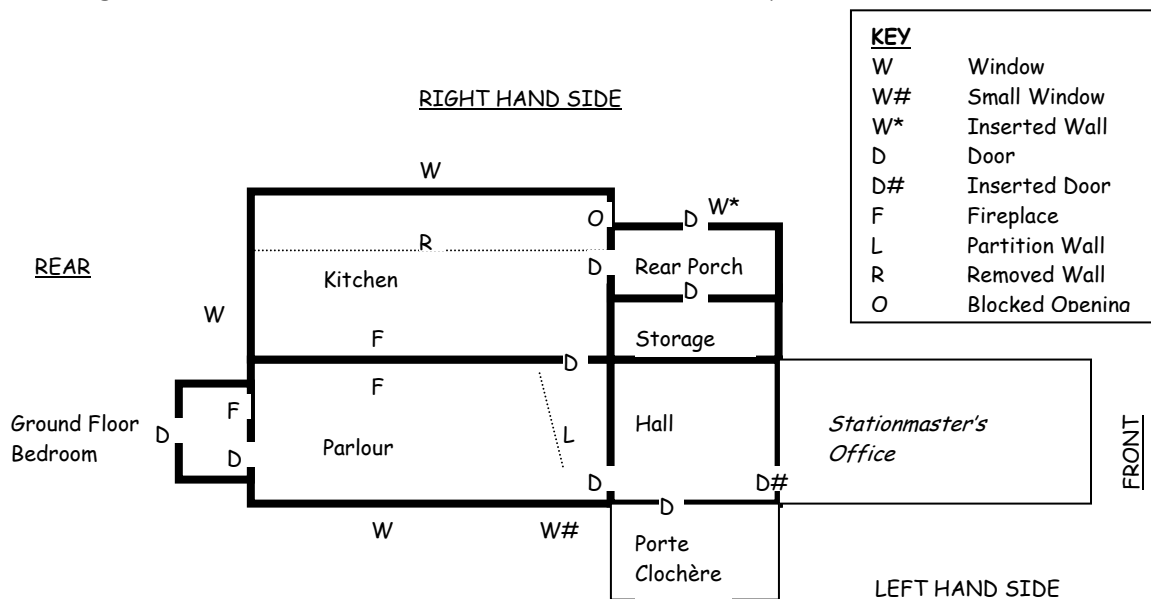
DOMESTIC ACCOMMODATION - GROUND FLOOR
